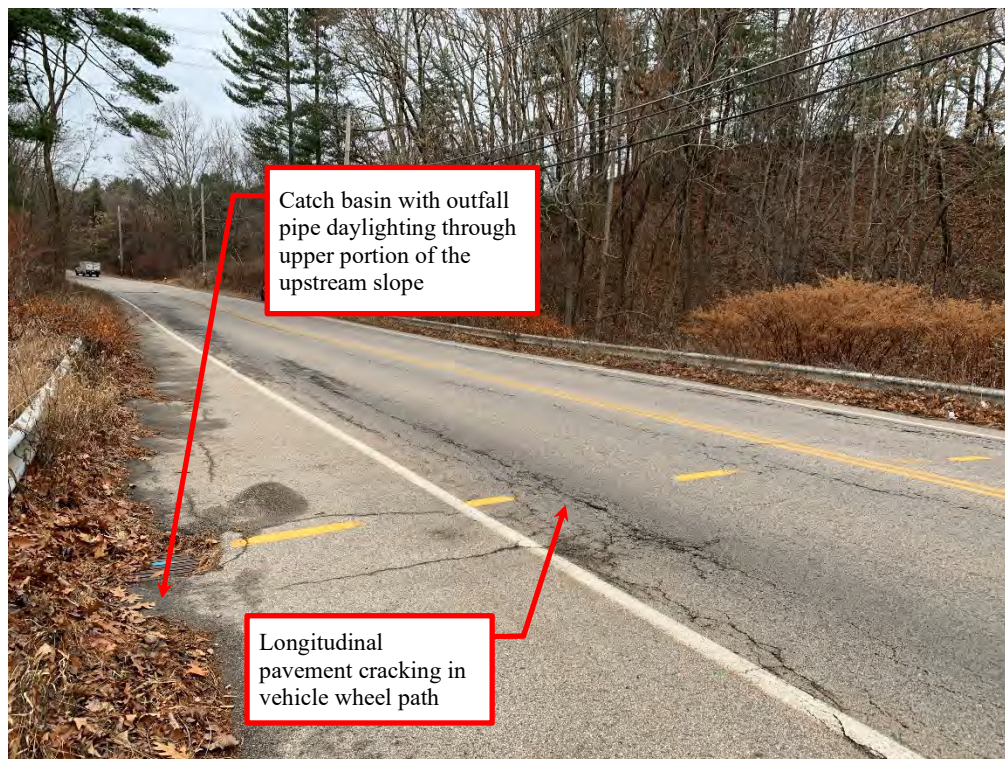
Overview of the dam crest (Boston Road) from the spillway, facing the left abutment.
